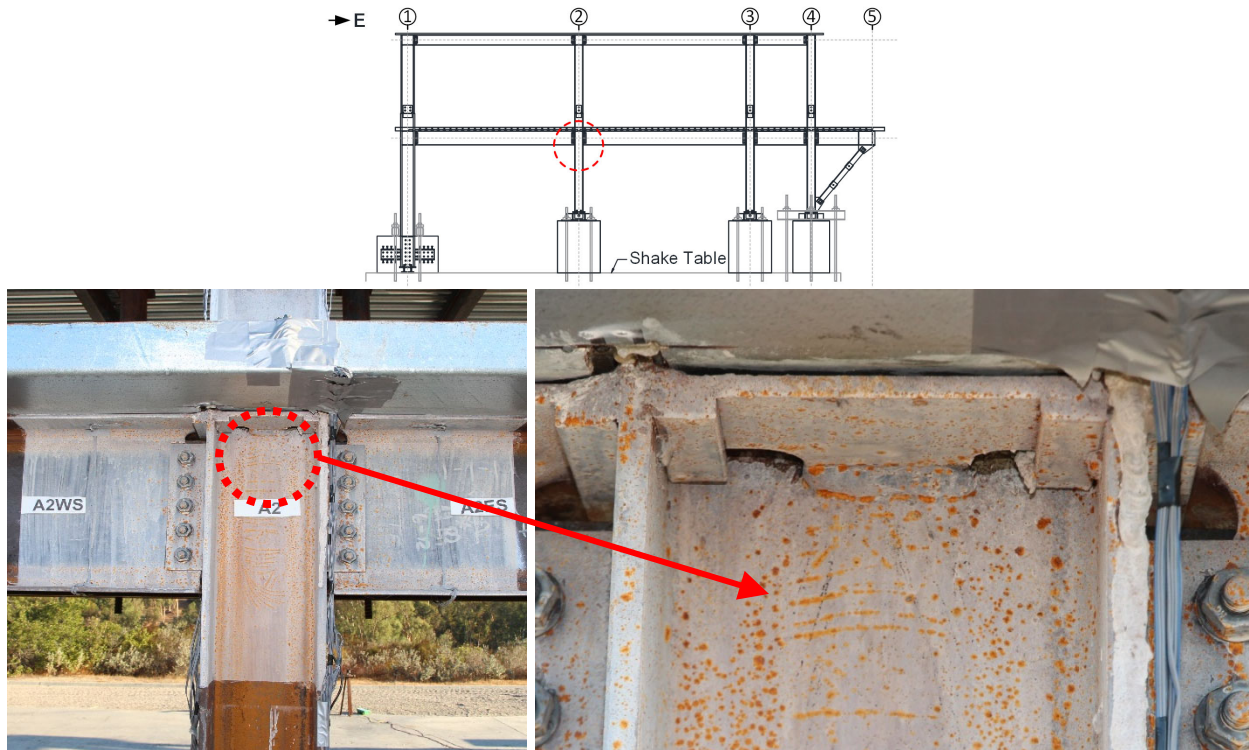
After Test 2B-3: Minor Flaking of Whitewash in Column Panel Zone of 2<sup>nd</sup> Floor TFW Connections
